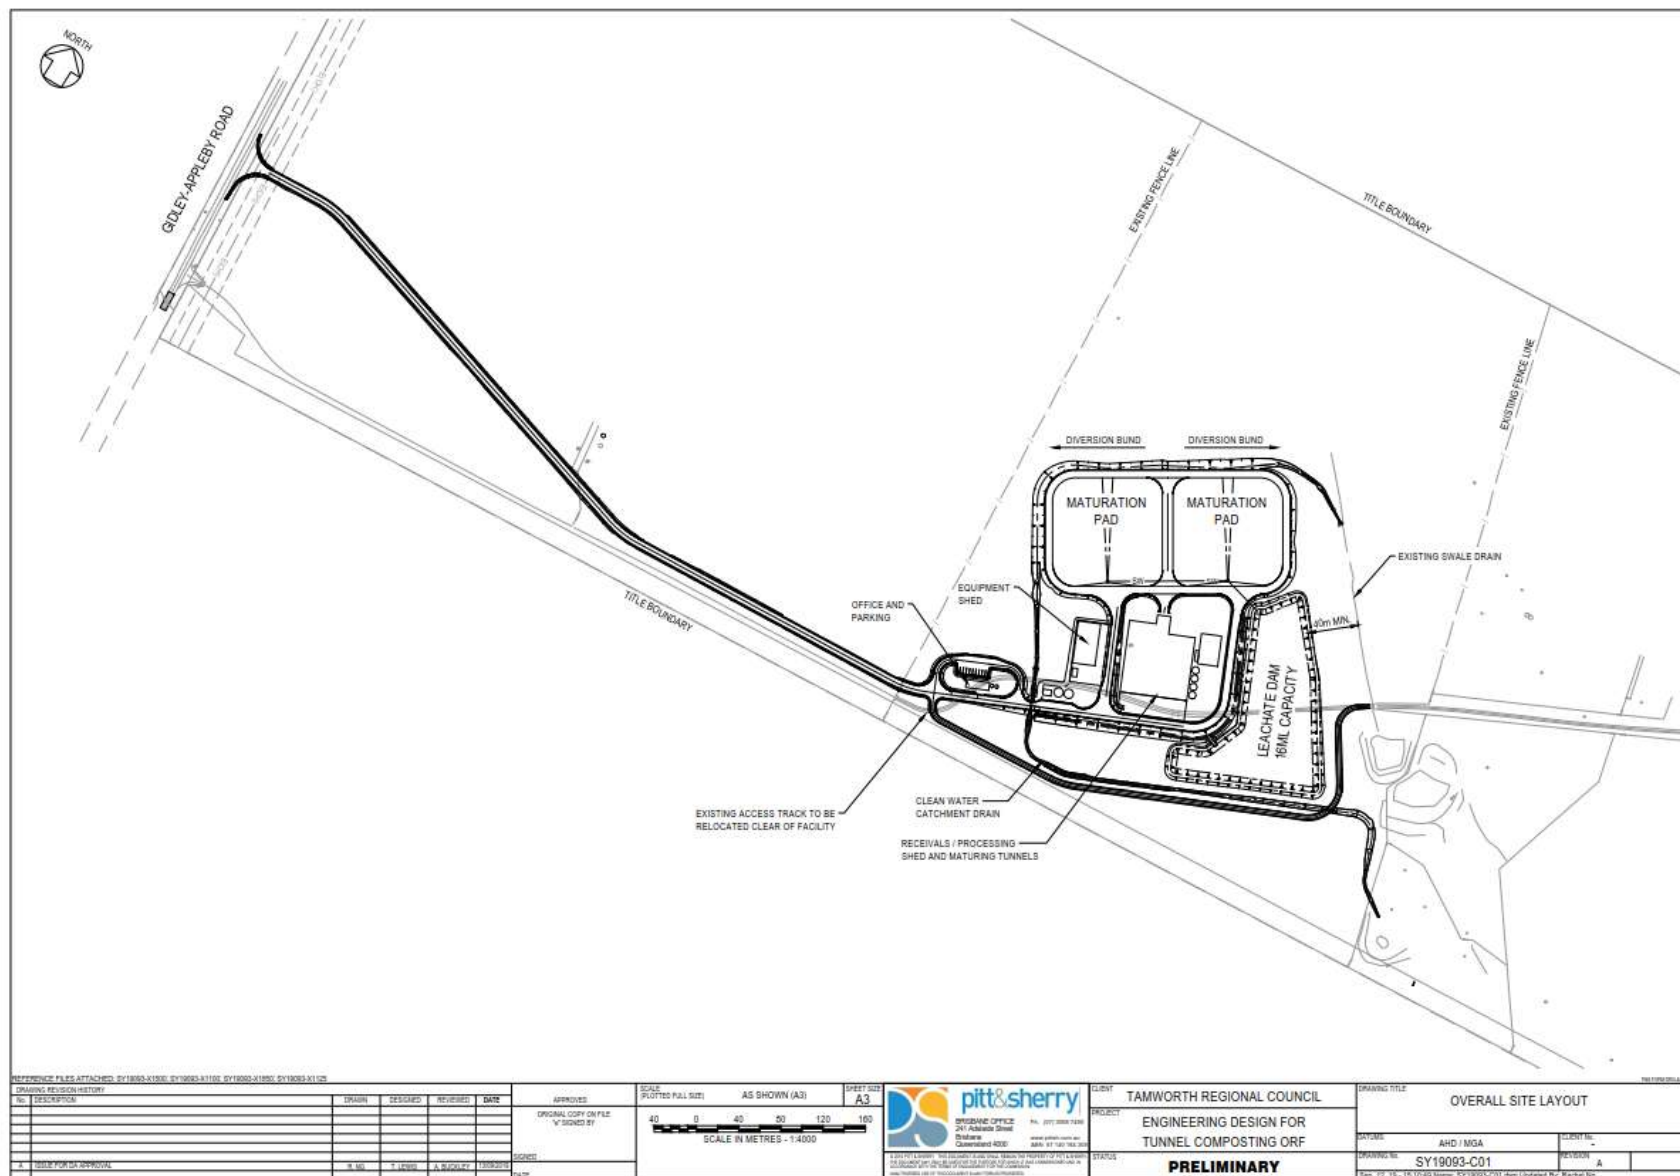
Concept Design – Proposed Facility Layout (Source: pitt&sherry)
